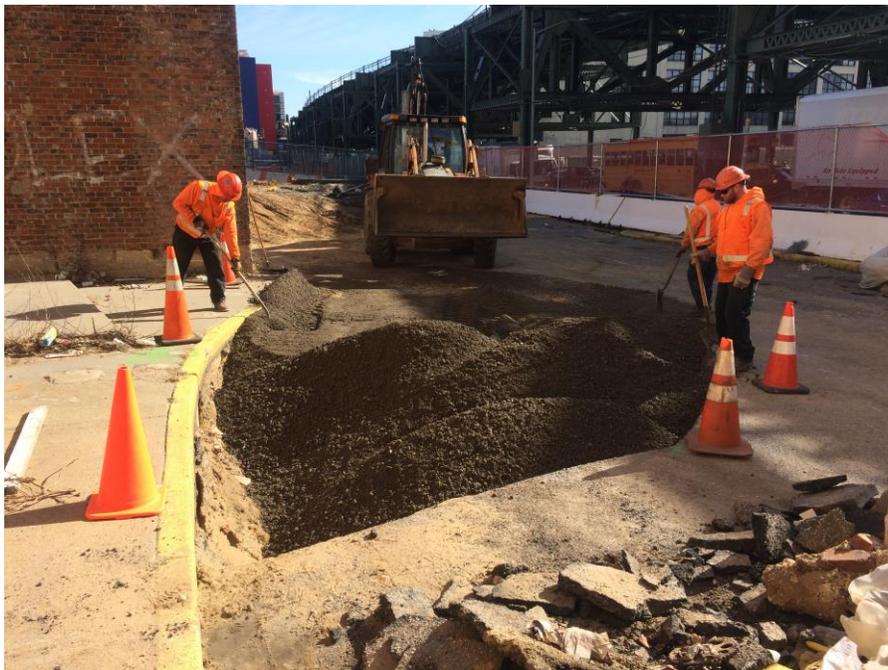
AARCO using shovels to backfill the excavation with RCA (facing north).
